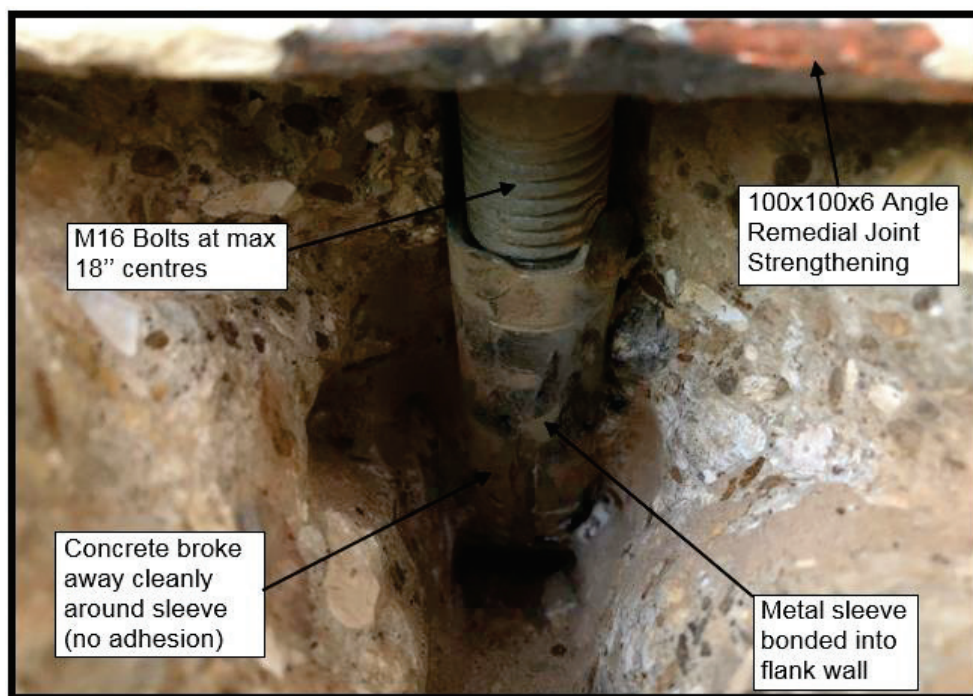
Photo-log of pocket around sleeved anchor into flank wall panel.
